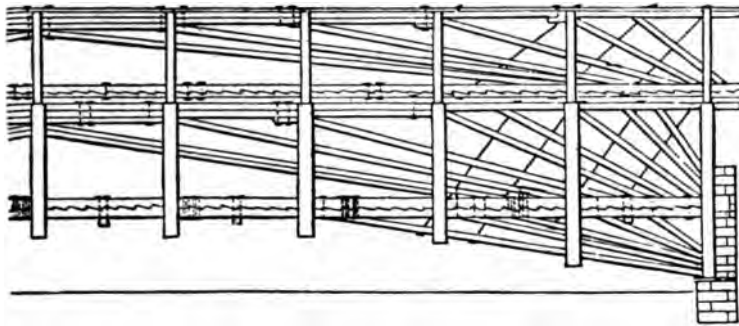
BRIDGE OF SHAUFFHAUSEN.
